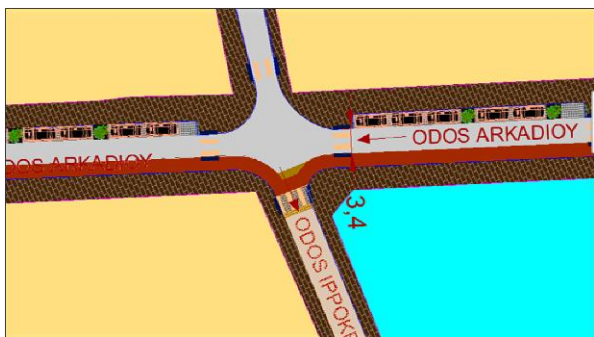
Arkadiou and Ippokratous str. intersection showing the crossroad application
